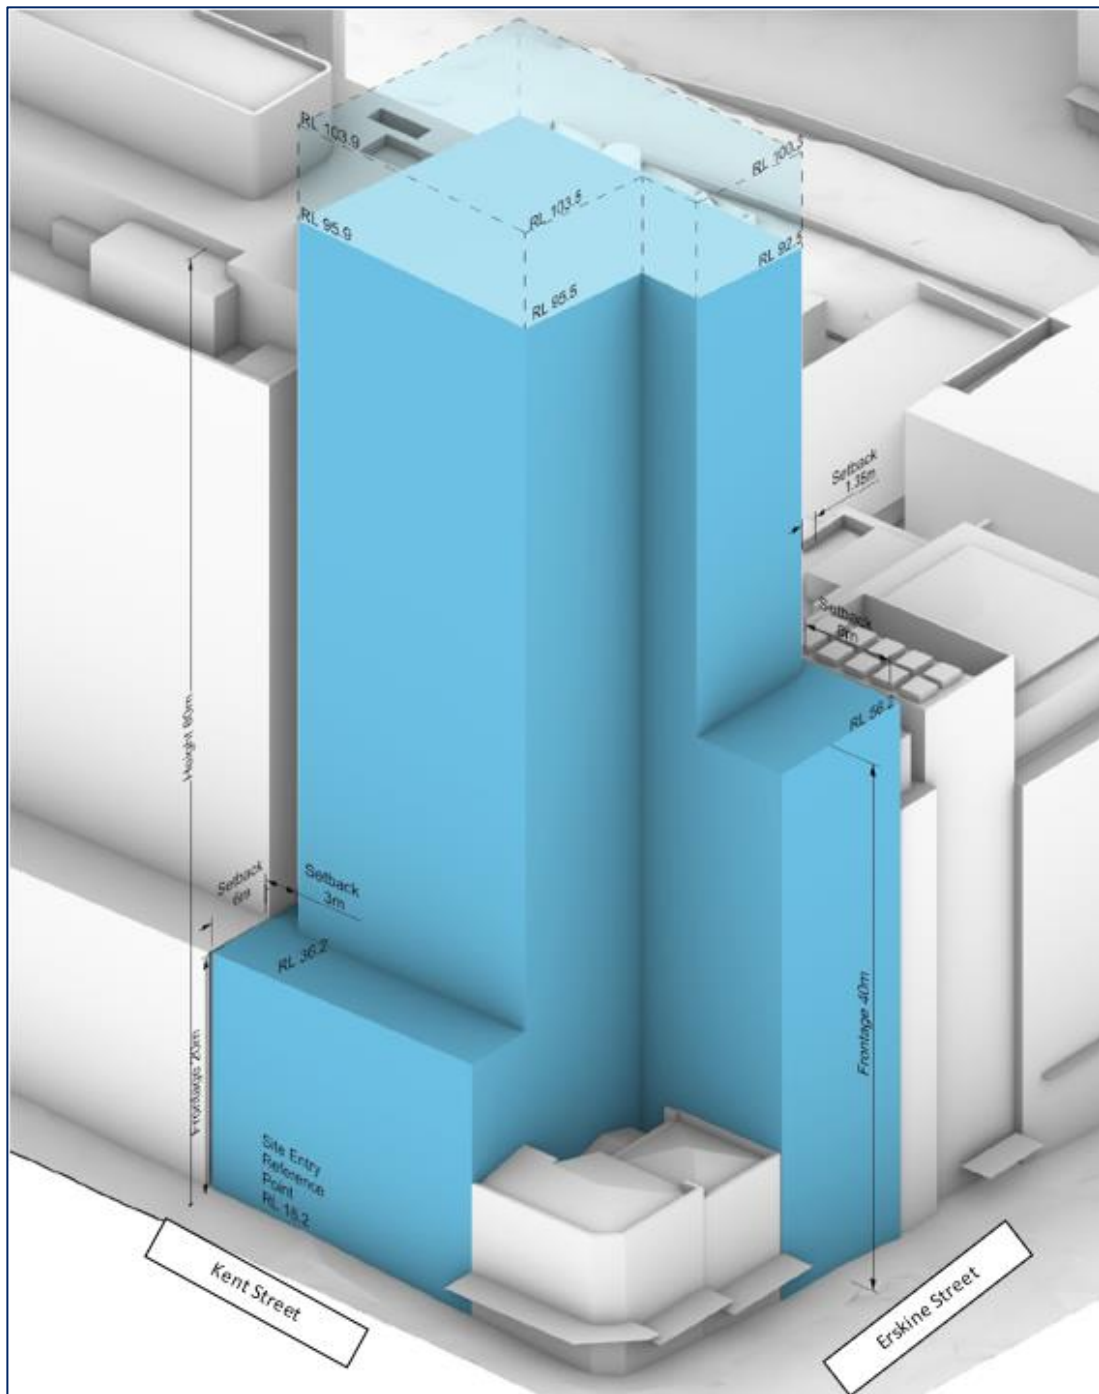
| Proposed building envelope (base source: Architectural drawings ARRtS)
